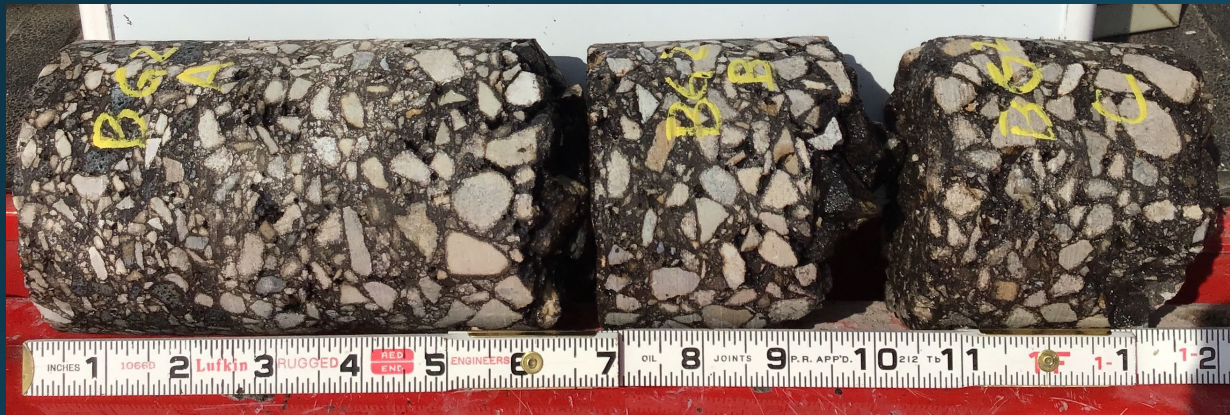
D. Typical Core Location for Alligator Cracking Corresponding to a Longitudinal Pavement Structure Joint
